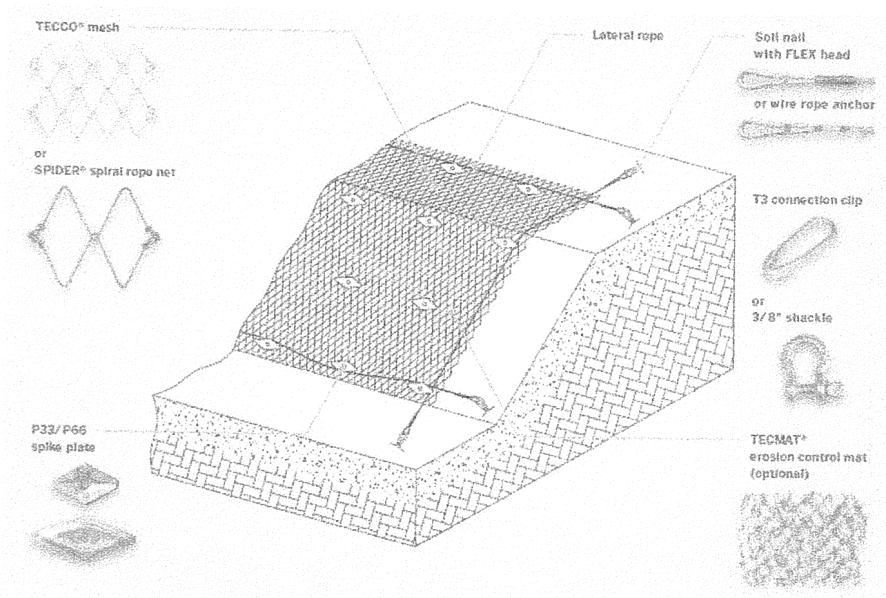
Example of slope stabilization with the TECCO[®] SYSTEM³
